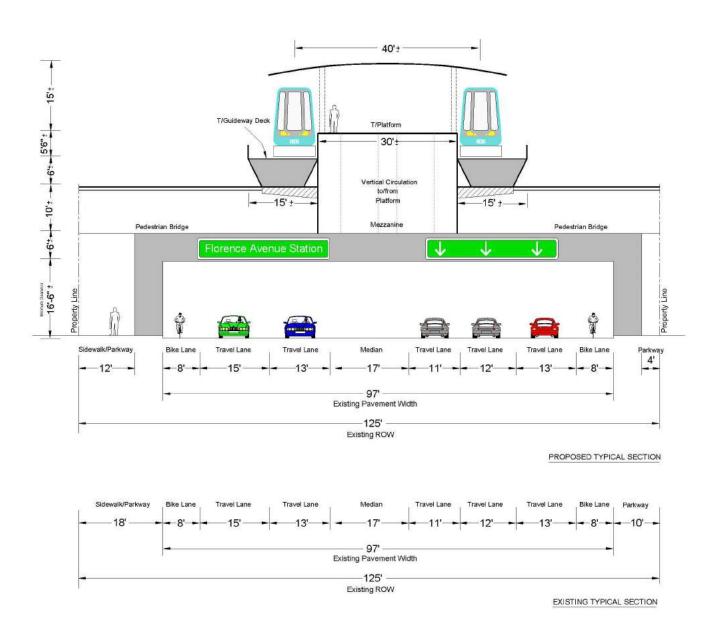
Alternative B: Fairview Heights Alignment Florence Avenue, Looking West at Station
